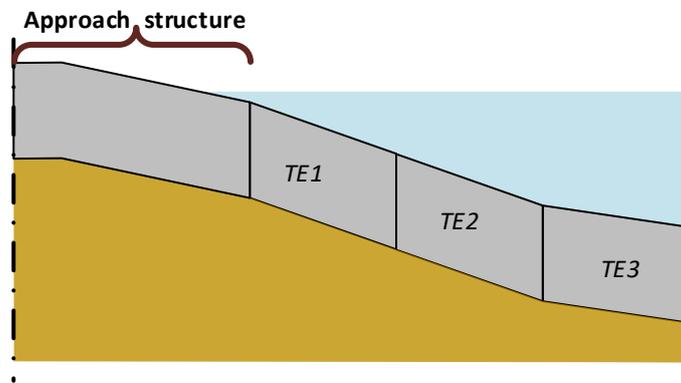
, APPROACH STRUCTURE LOCATION; LONGITUDINAL VIEW
